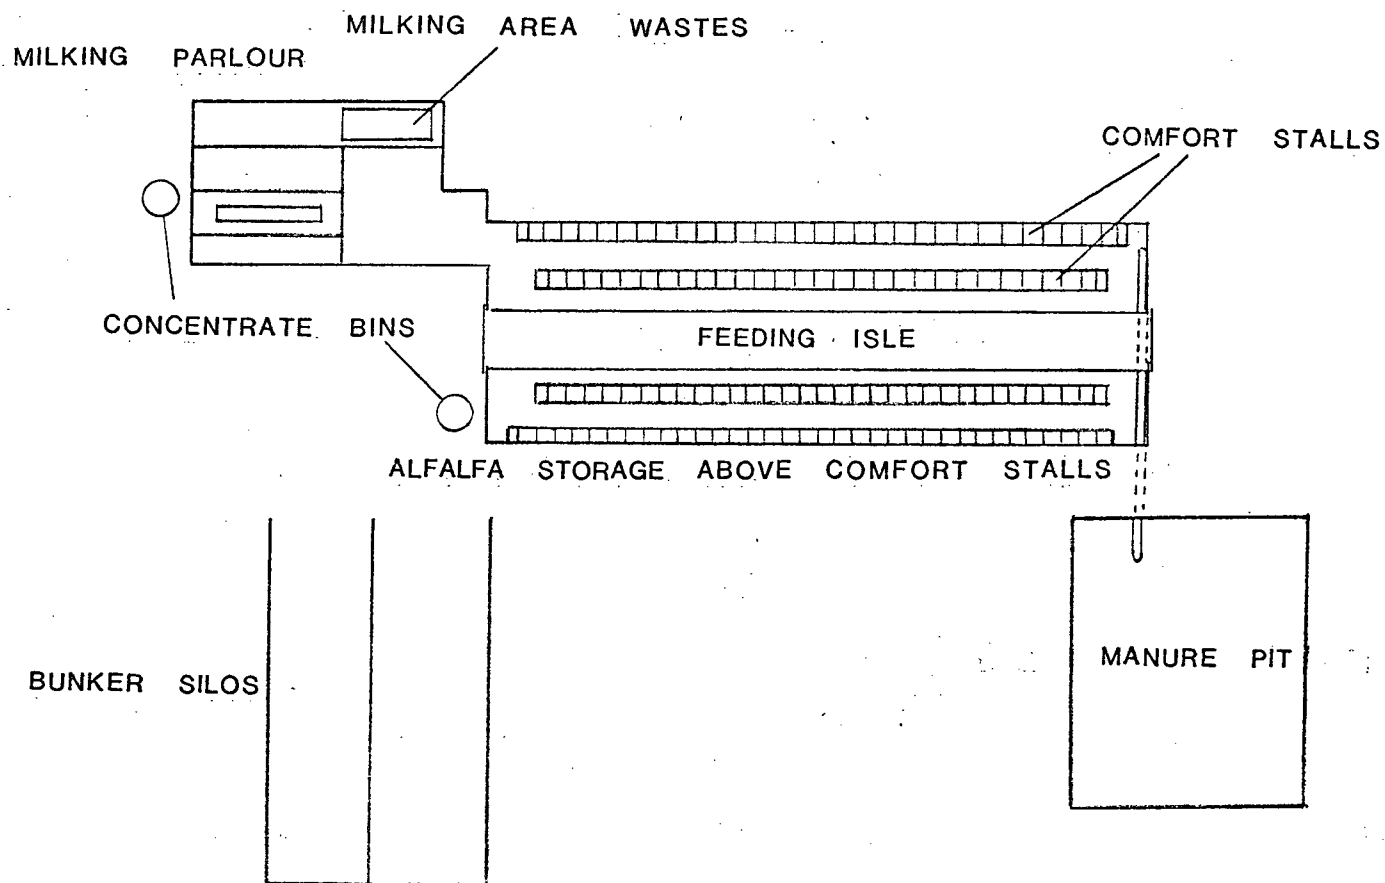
BEAVER MEADOW FARM BUILDING LAYOUT
